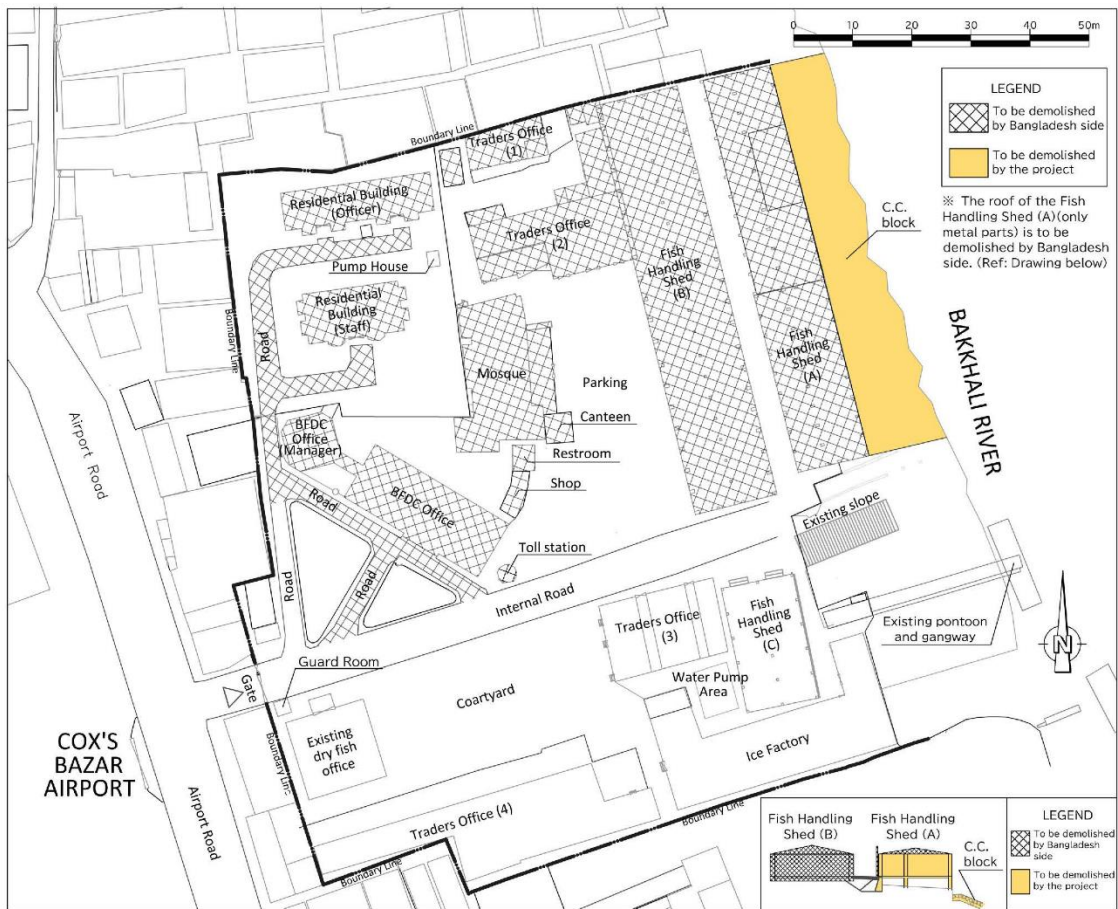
Scope of removing and clearing existing facilities and structures
